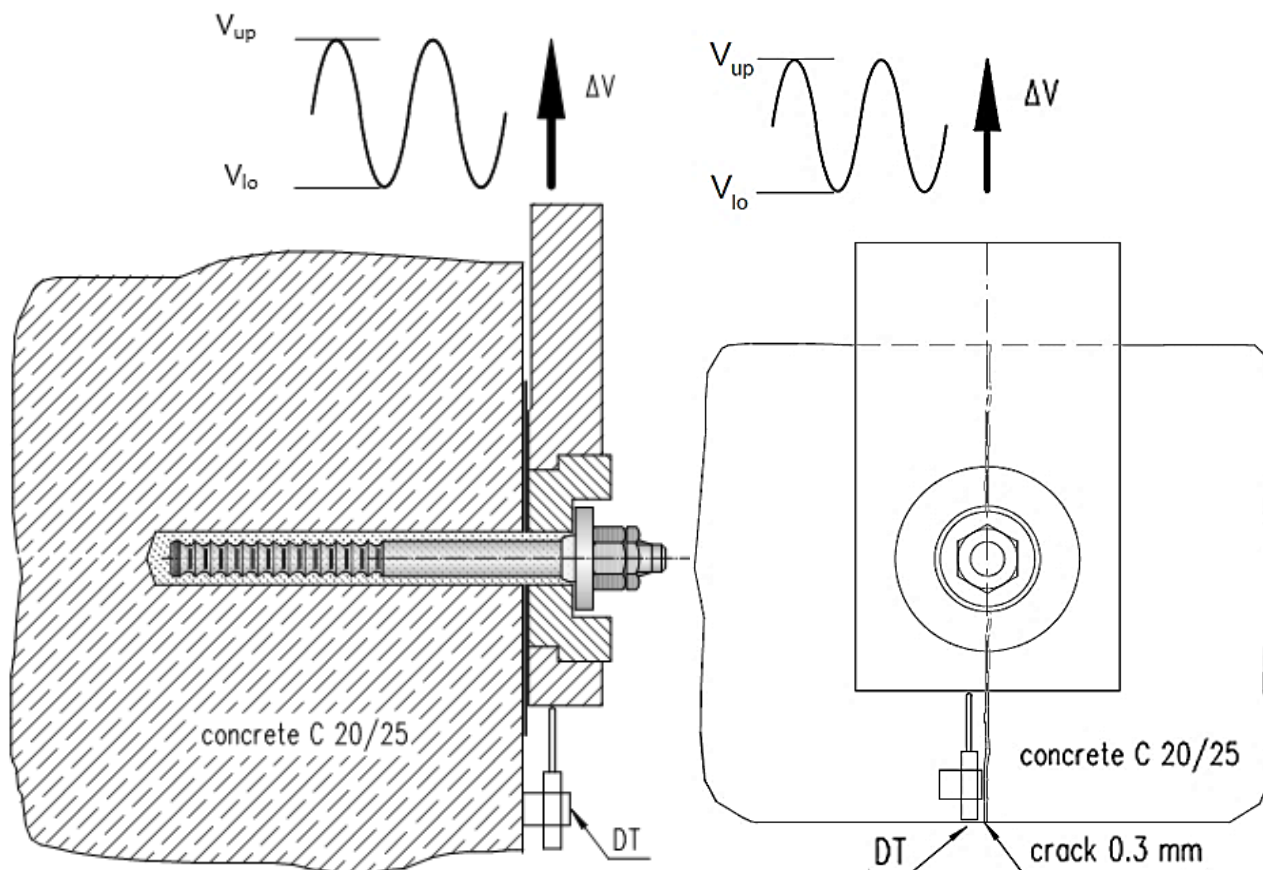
Example of test setup for steel failure under shear in cracked concrete with displacement transducer (DT)
